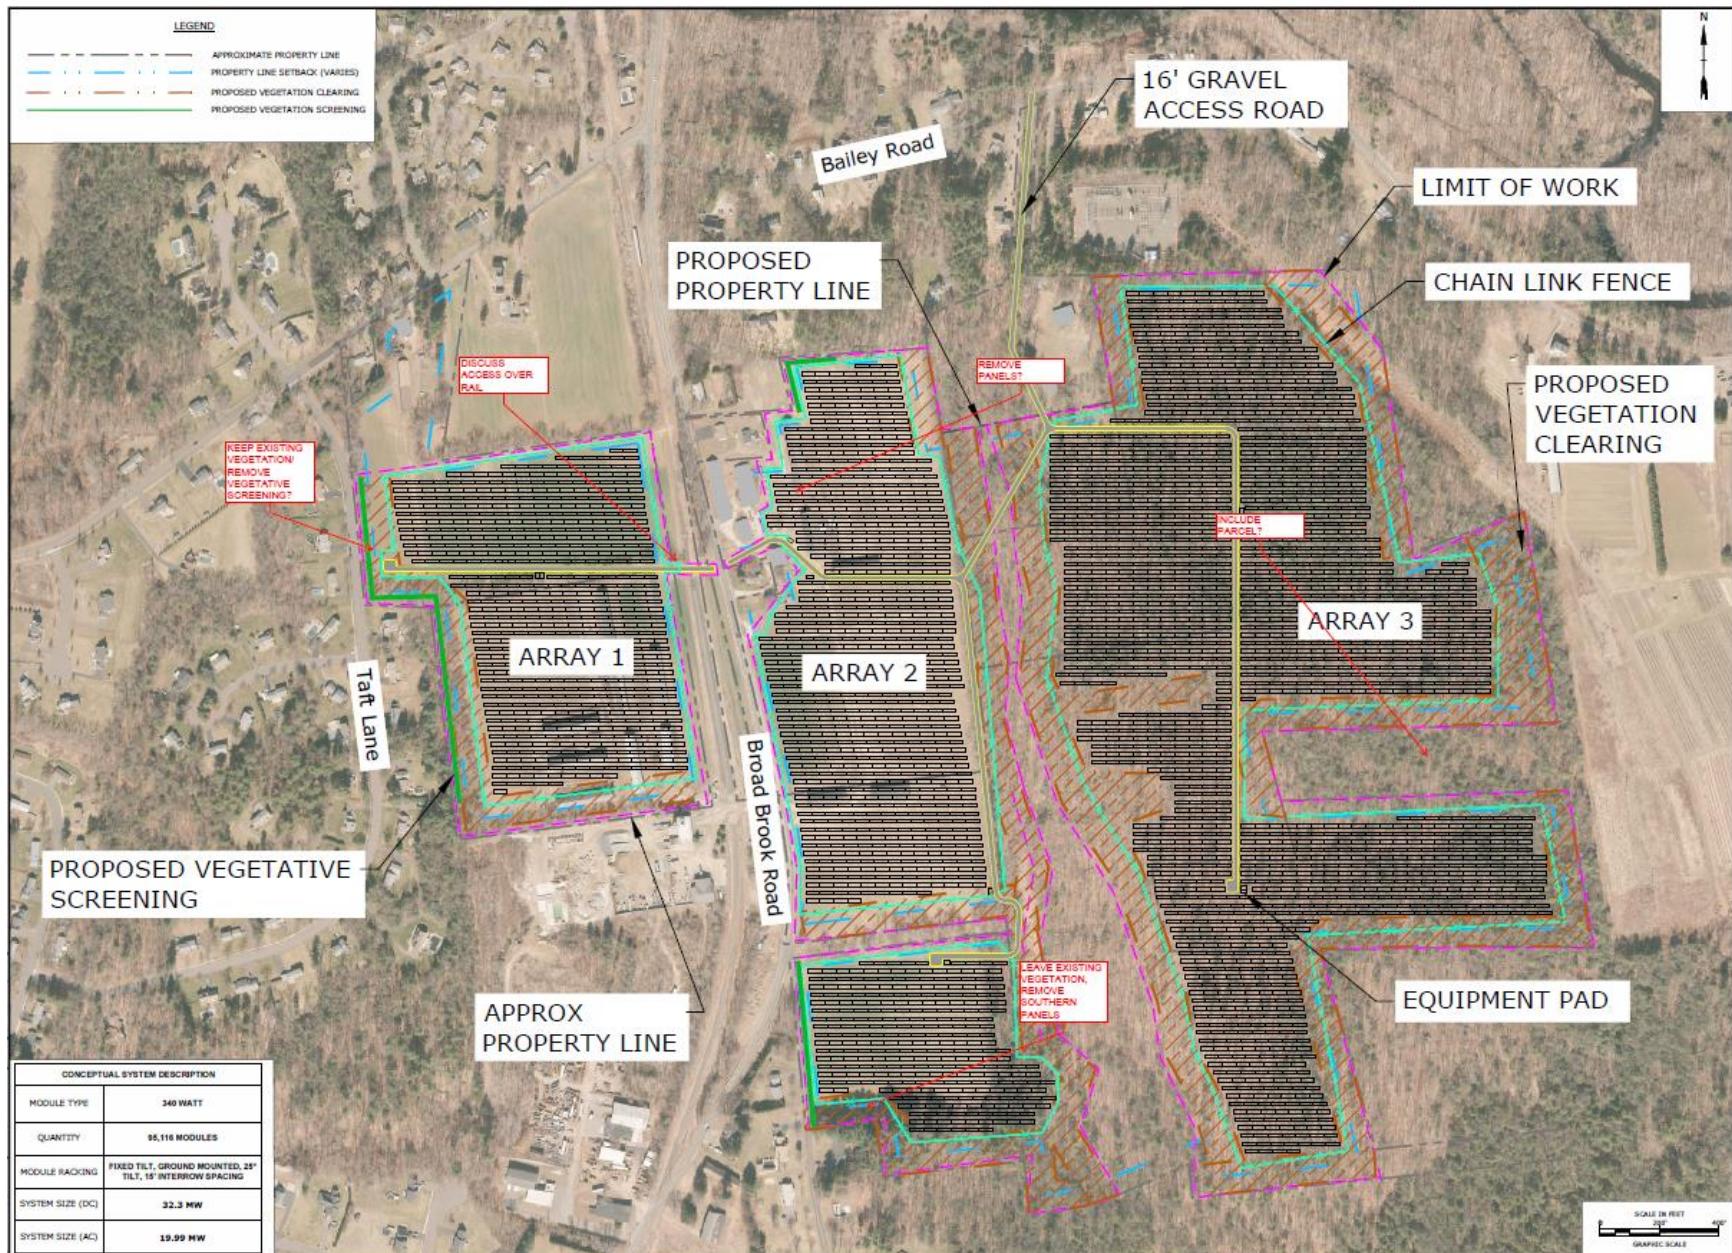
Current construction plan for the proposed solar facility in Enfield, Connecticut.
